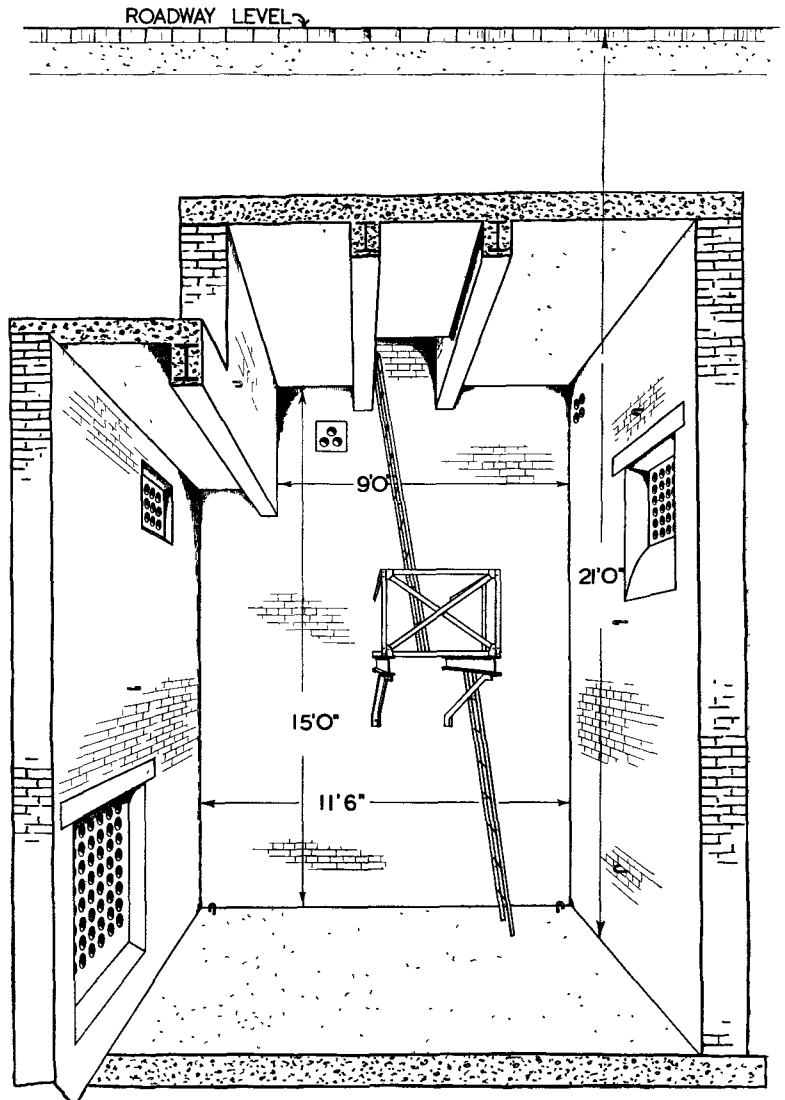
MANHOLE AT LANGHAM PLACE.
